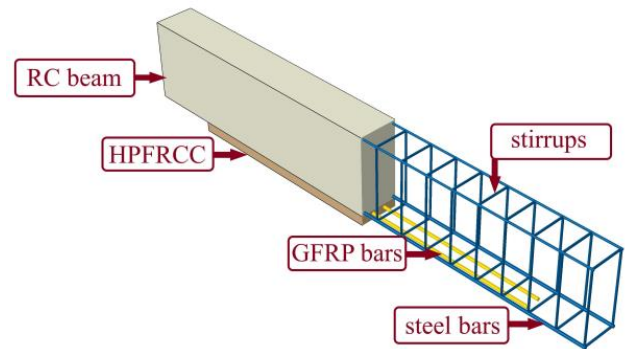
Strengthened RC beam configuration with HPFRCC sheet and embedded GFRP bars.
